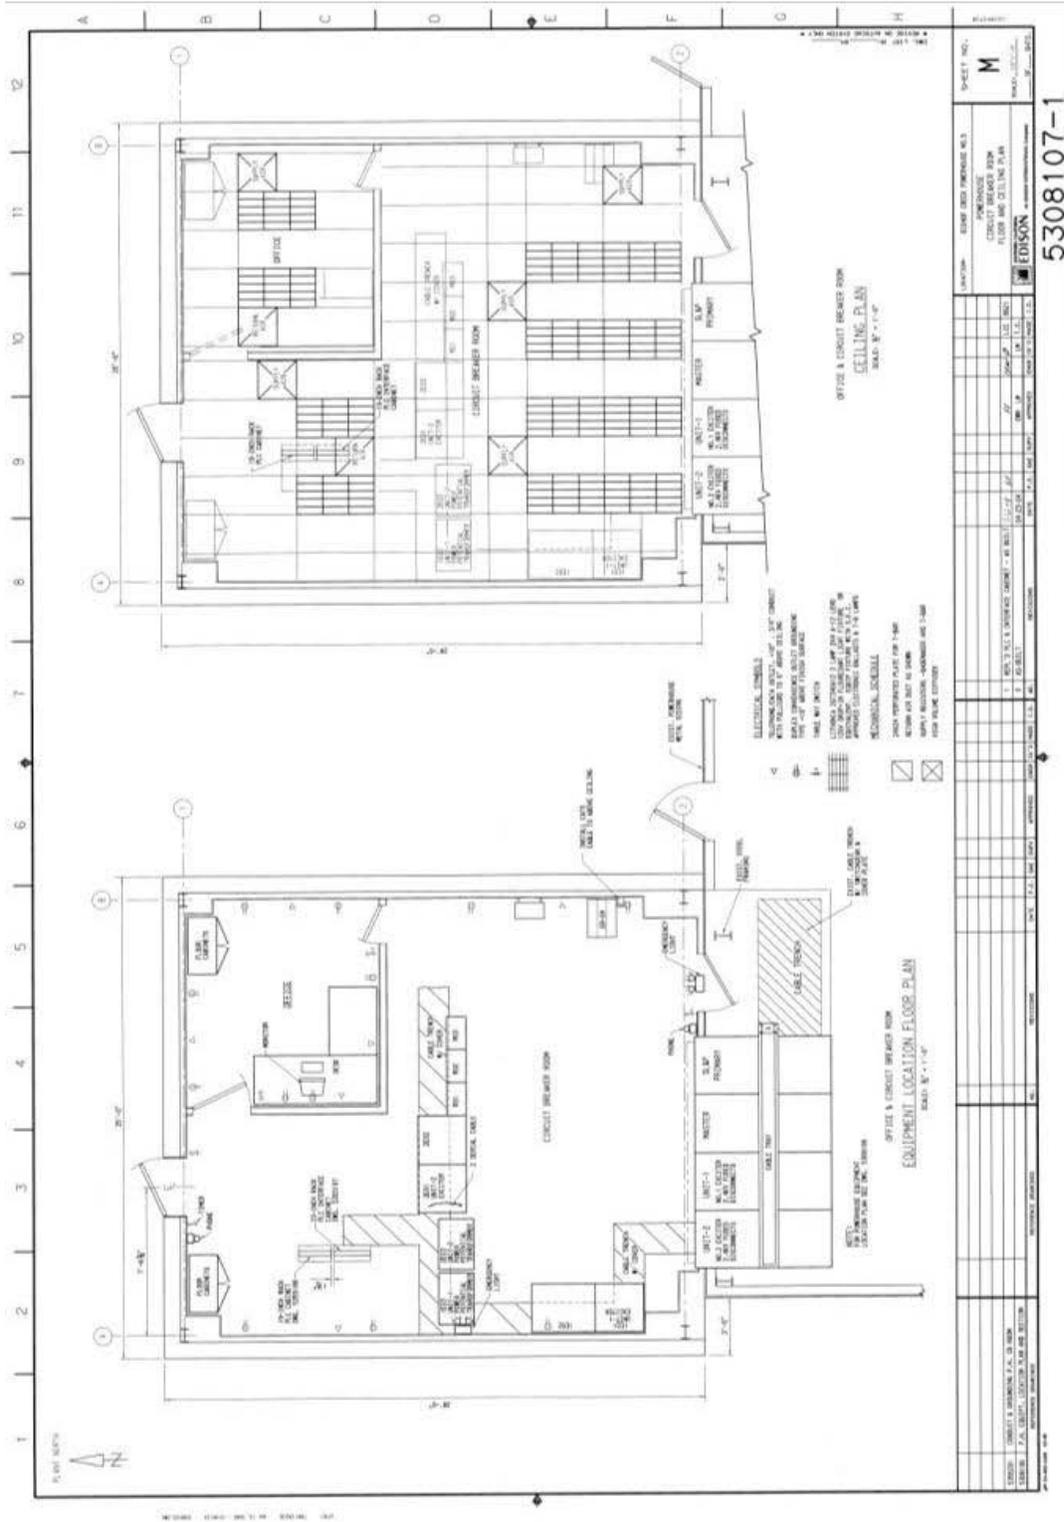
Southern California Edison Company, “Powerhouse Circuit Breaker Room Floor and Ceiling Plan,” April 23, 2004; revised May 12, 2008. SCE Drawing No. 5308107-1.
